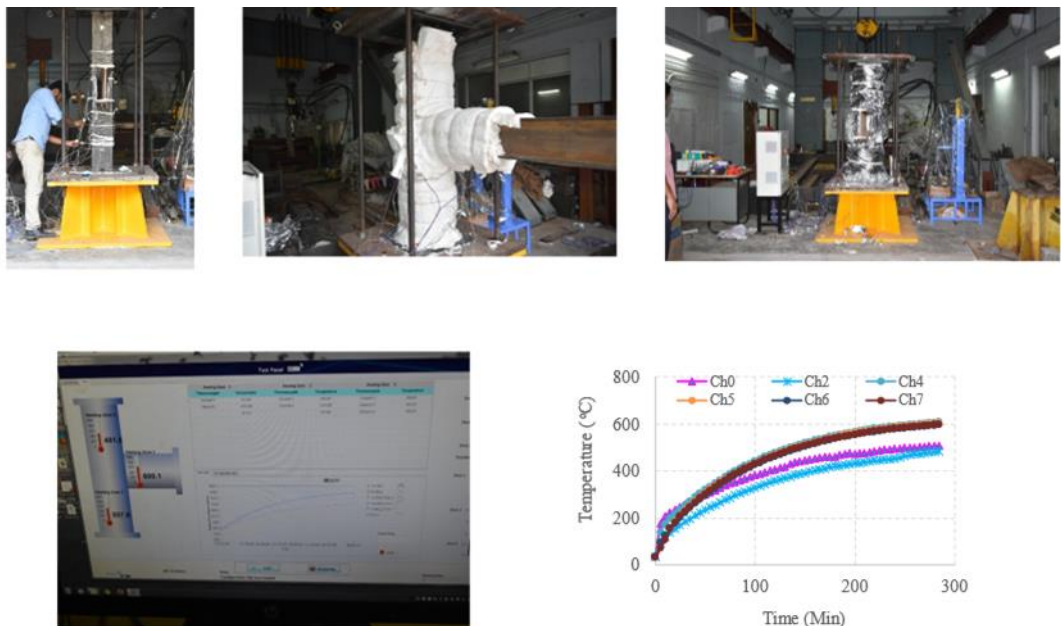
Photograph showing elevated temperature resistance studies on Steel beam-to-column connections
